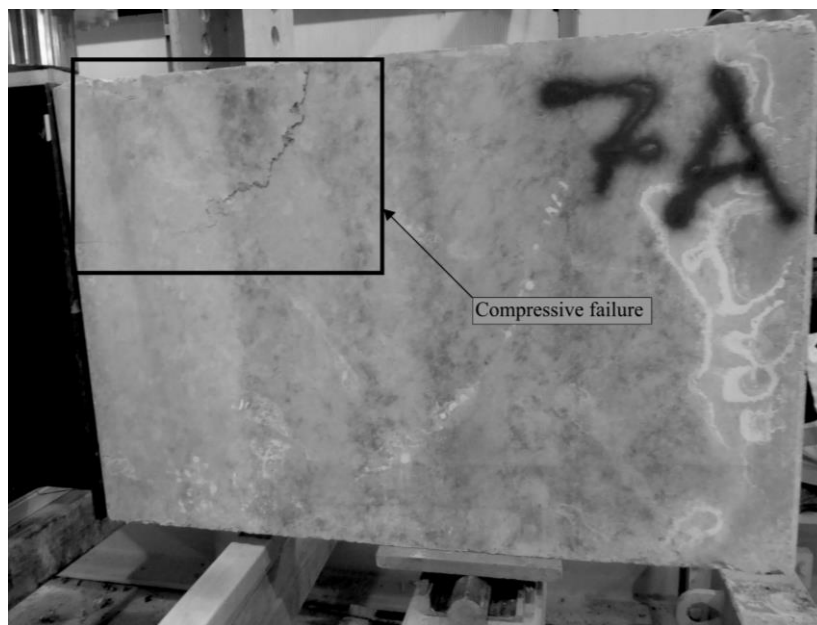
A compressive failure in the upper part of the hollow core unit, due to rotation of the test specimen around the steel beam.
